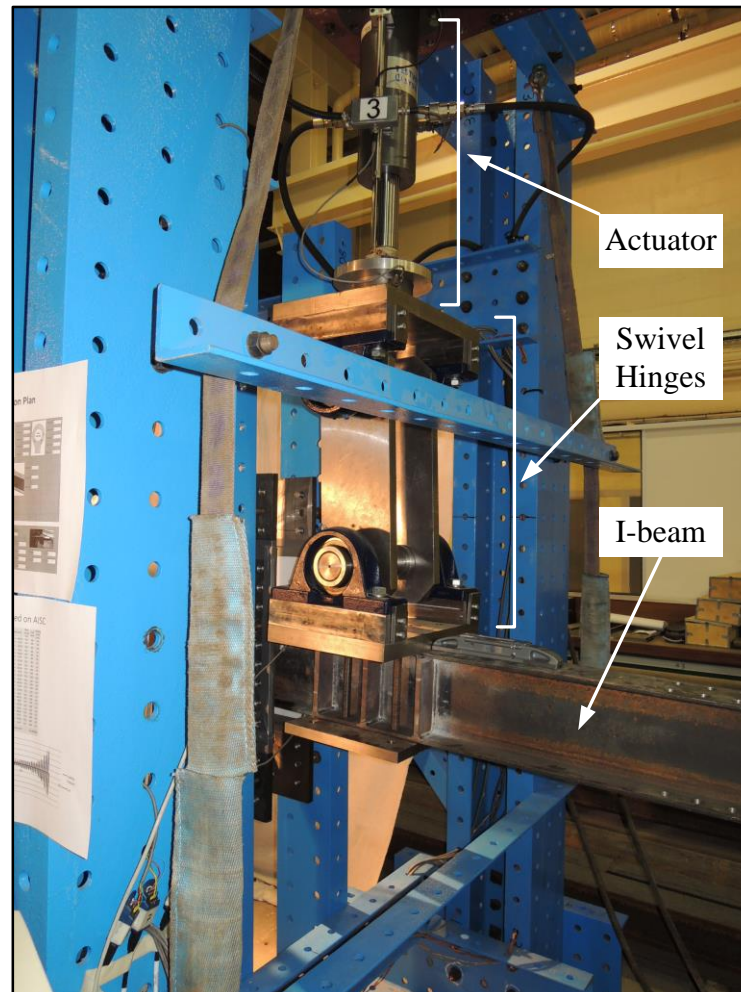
Test specimen assembled inside the test rig in the Structures Laboratory
